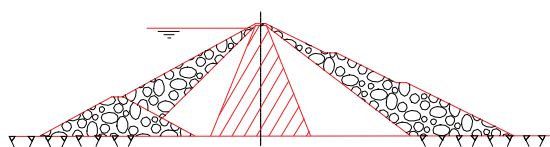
Typical cross-section of a rockfill dam with a central clay core.
